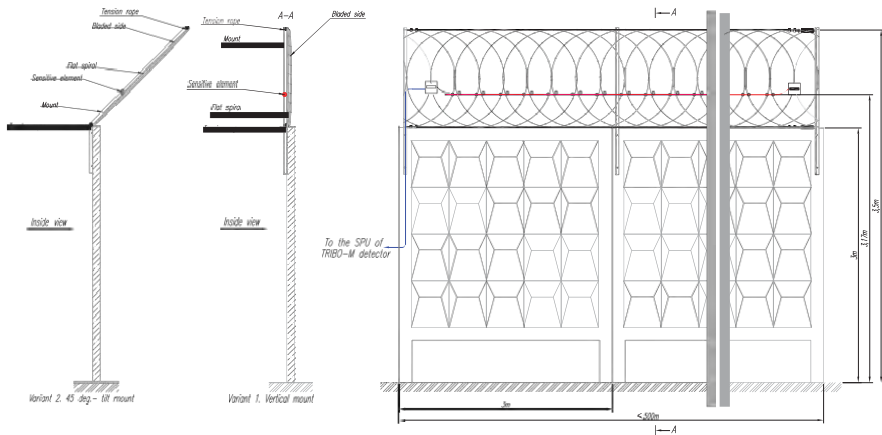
SENSITIVE ELEMENT LAYOUT ON RAZOR WIRE FLAT SPIRAL FENCE EXTENSIONS
